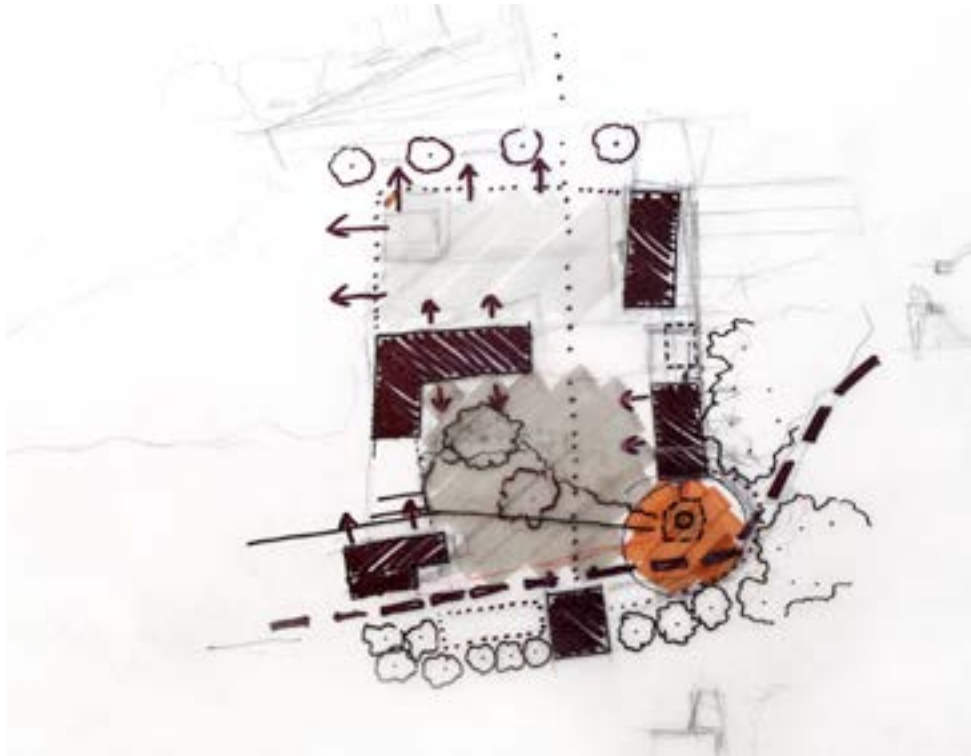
Conceptual development of plan layout and outdoor spaces. Author, 2014.
